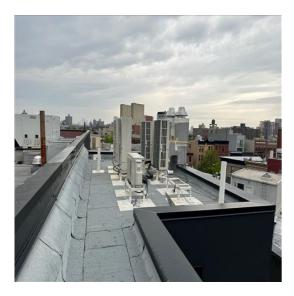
Observation: Overview photos of the roof at 373 Prospect PI. The roof covering was observed to be TPO.
